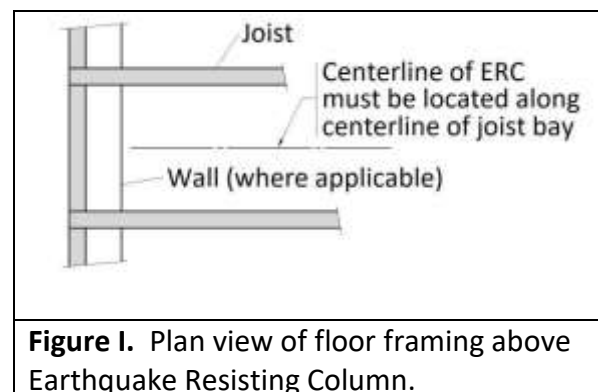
Figure I. Plan view of floor framing above Earthquake Resisting Column.
